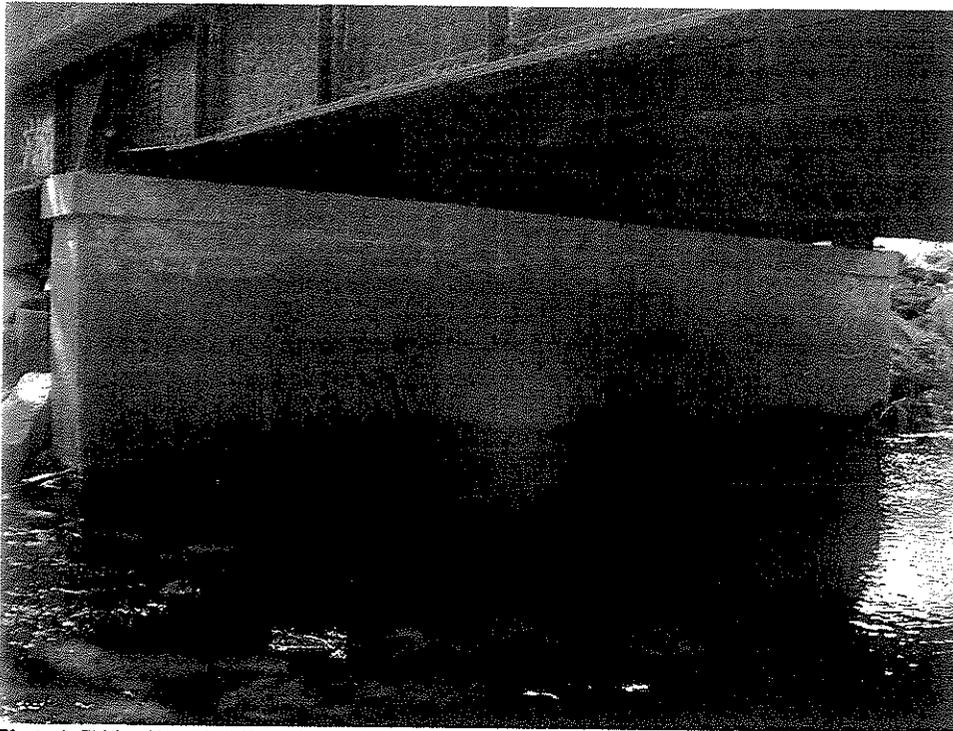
Bridge No. 14.81 Wall Pier voids and Scour
